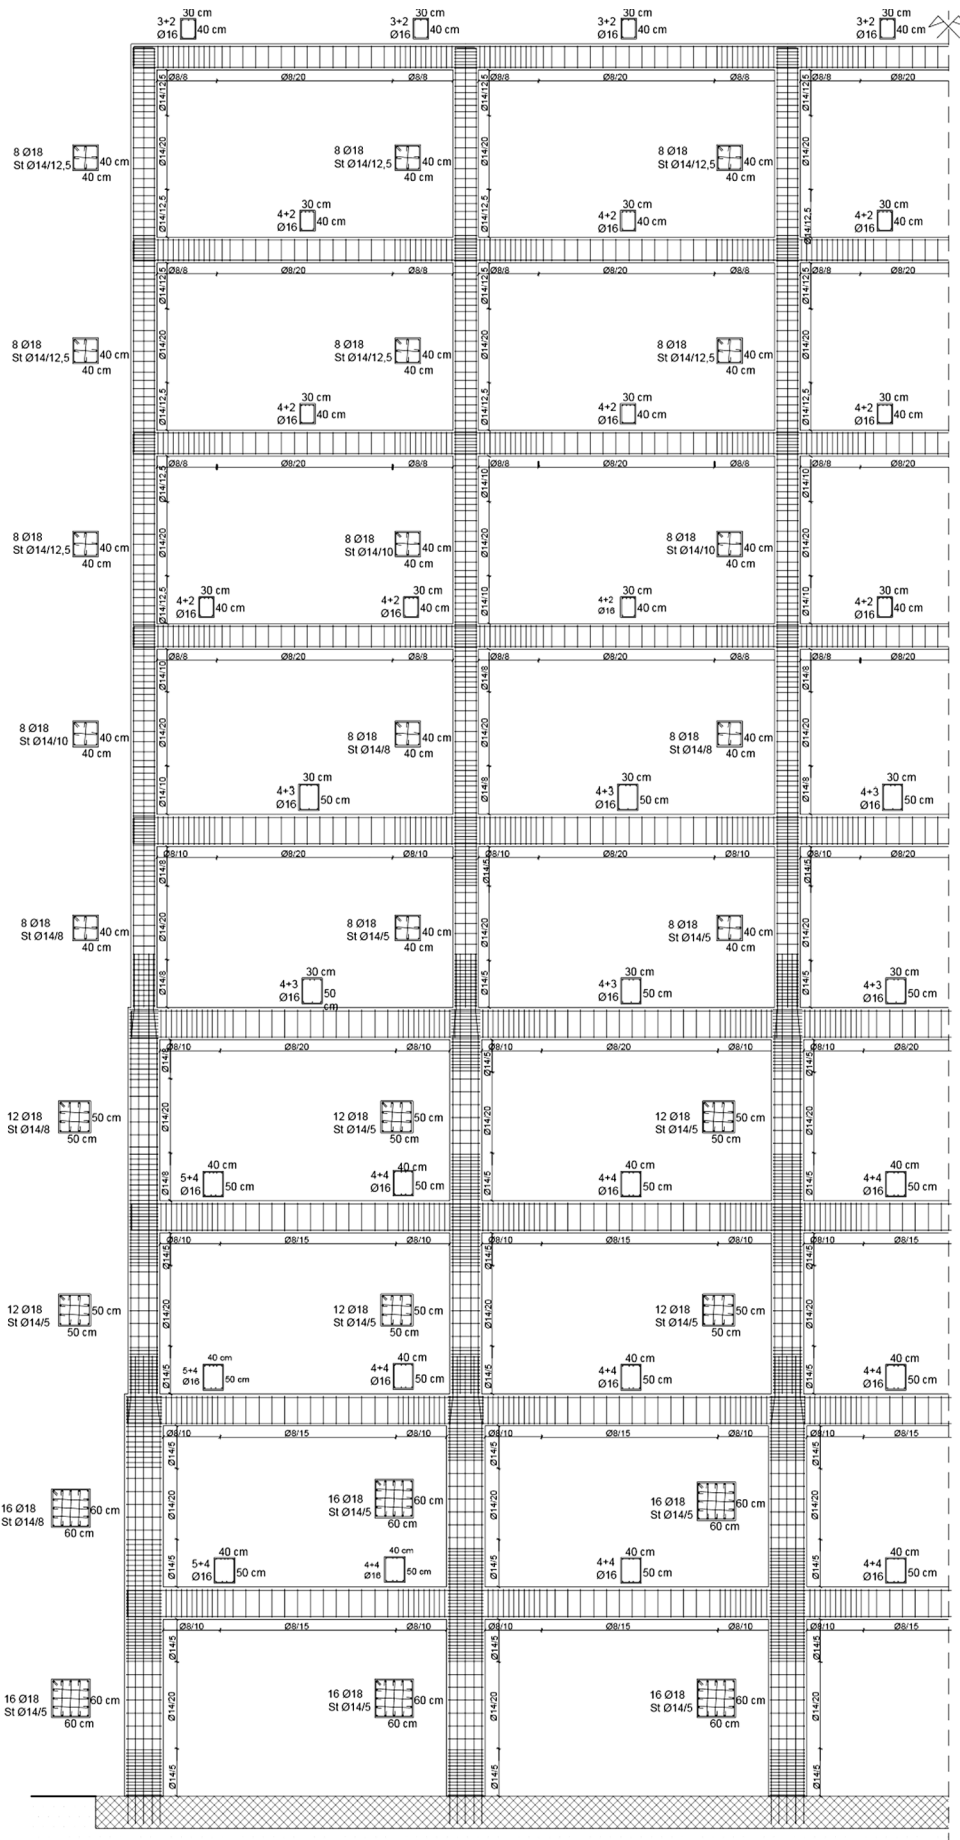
9-story RC frame archetype: reinforcement arrangement.
